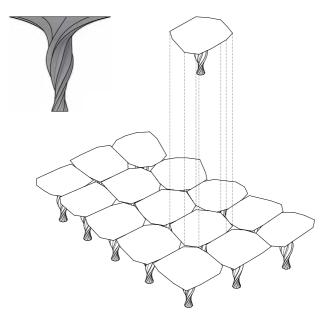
Parametrically designed formwork columns using twisting and various extrusion widths, shaped to match the roof structure.
